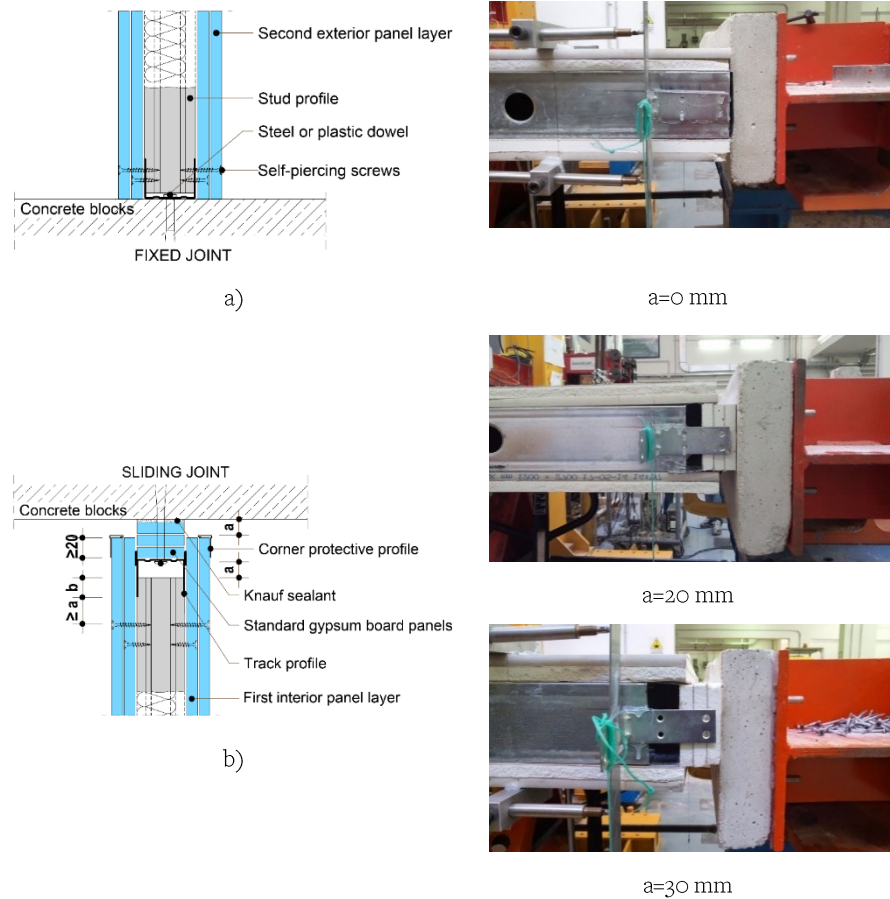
Details of the adopted wall-to-surrounding structure joints with the indication of gap a: a) fixed joint; b) sliding joint
